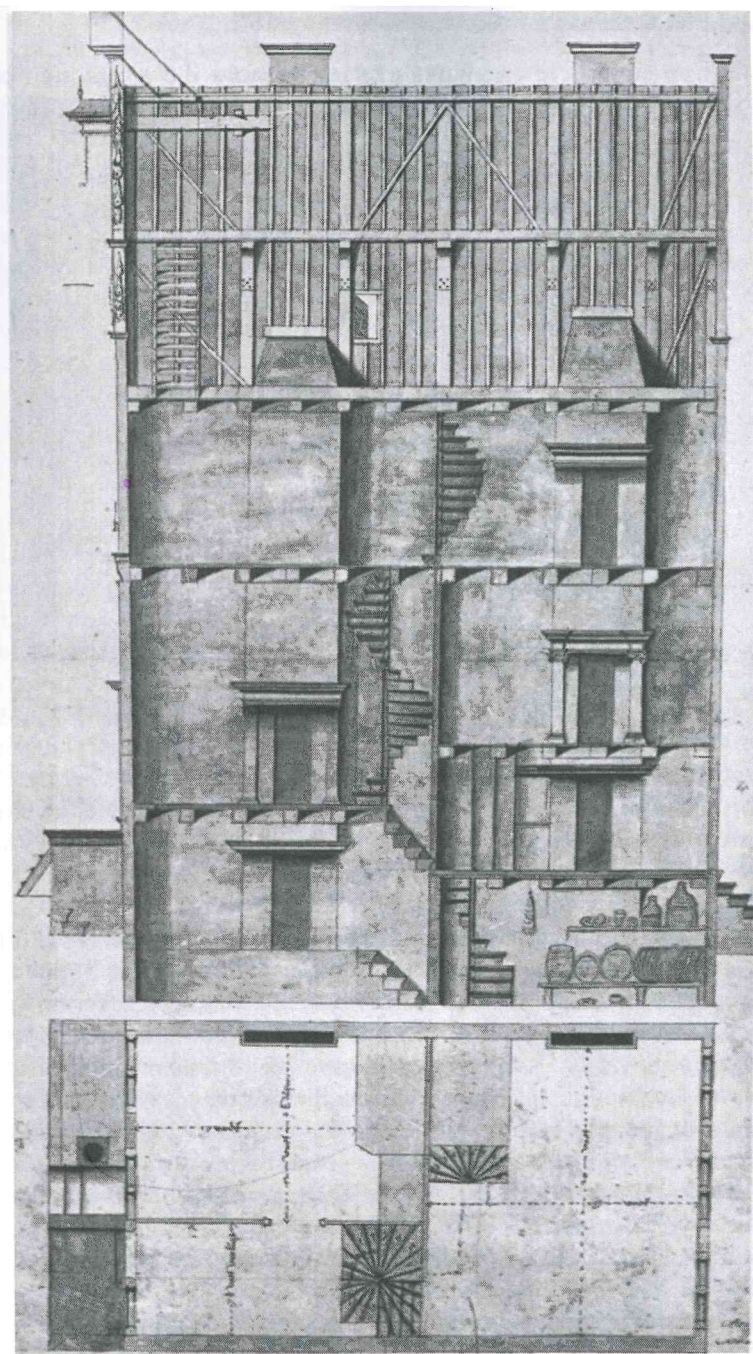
1670 section and plan of a "three-story" merchant's canal house (Amsterdam Parish Library). From Renée Kistemaker and Roelof van Gelder, *Amsterdam: The Golden Age, 1275–1795* (New York: Abbeville Press, 1983).
